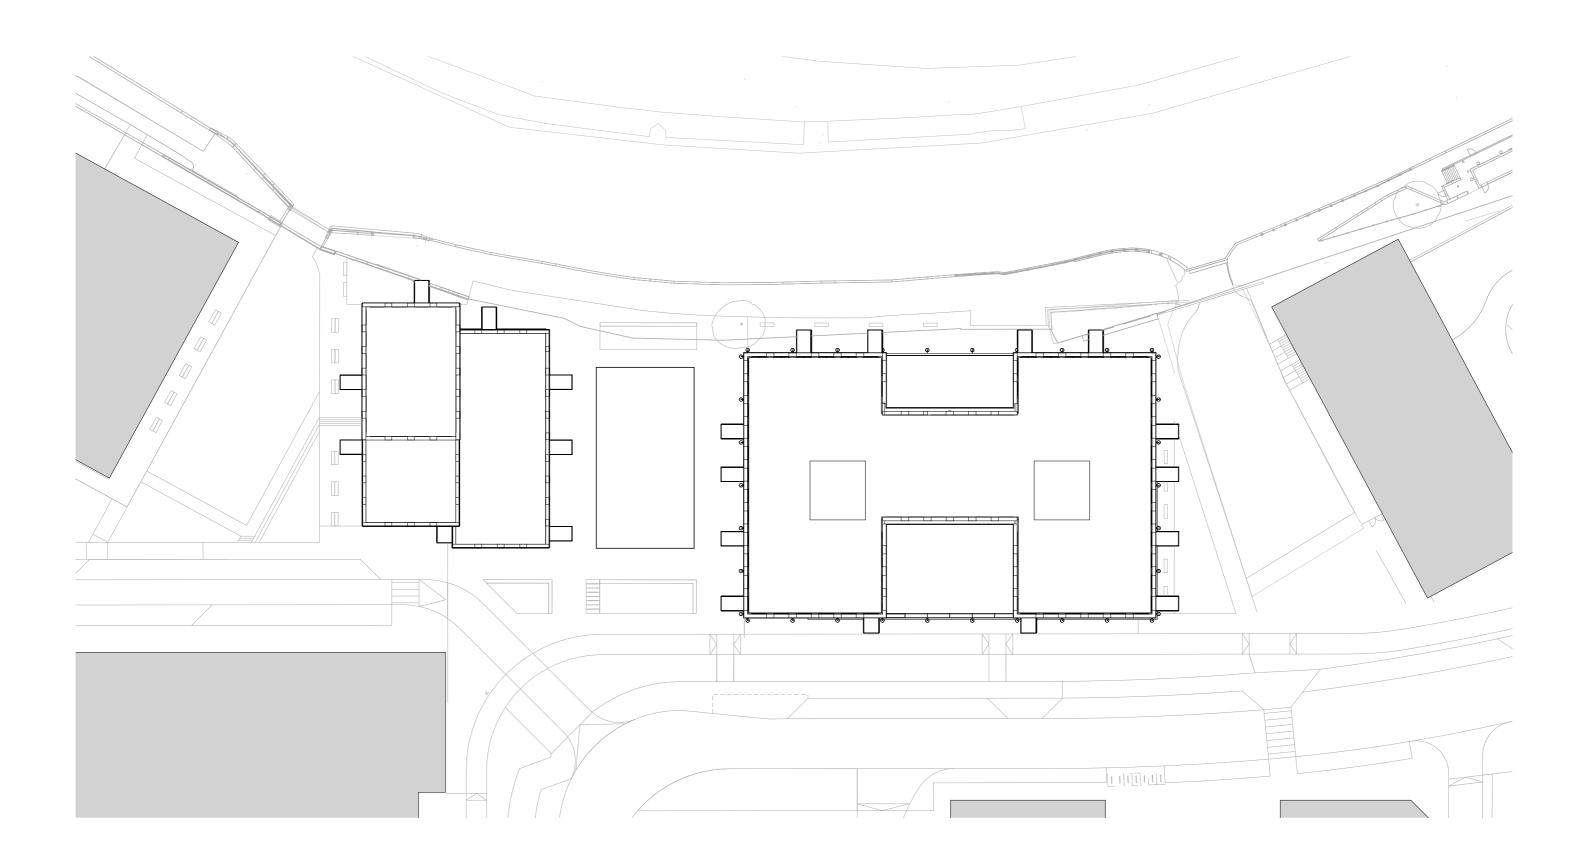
Plot 05 Ground Floor Layout in wider context showing offset distances to adjacent buildings
